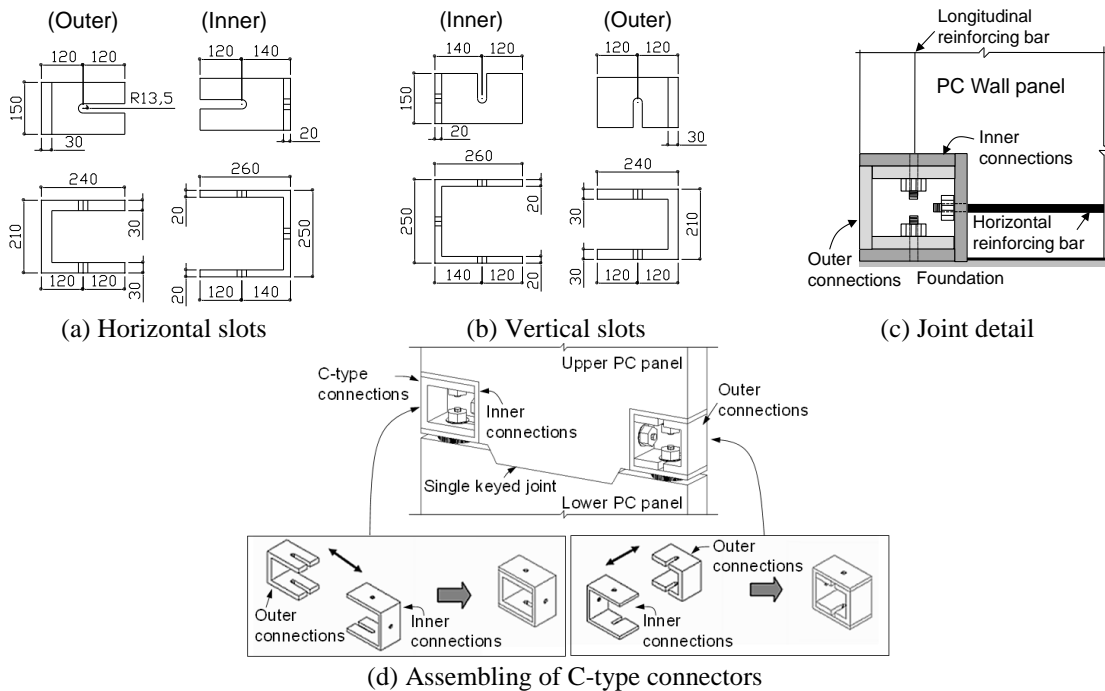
Details of C-type connections (Note: Dimensions in mm, 1 mm = 0.0394 in.)
